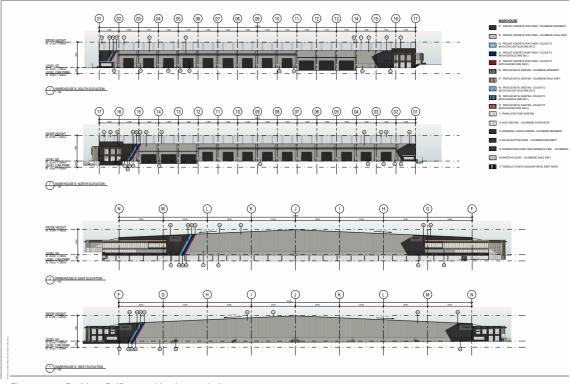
Warehouse Elevations - Building B (Source: Nettletontribe)
